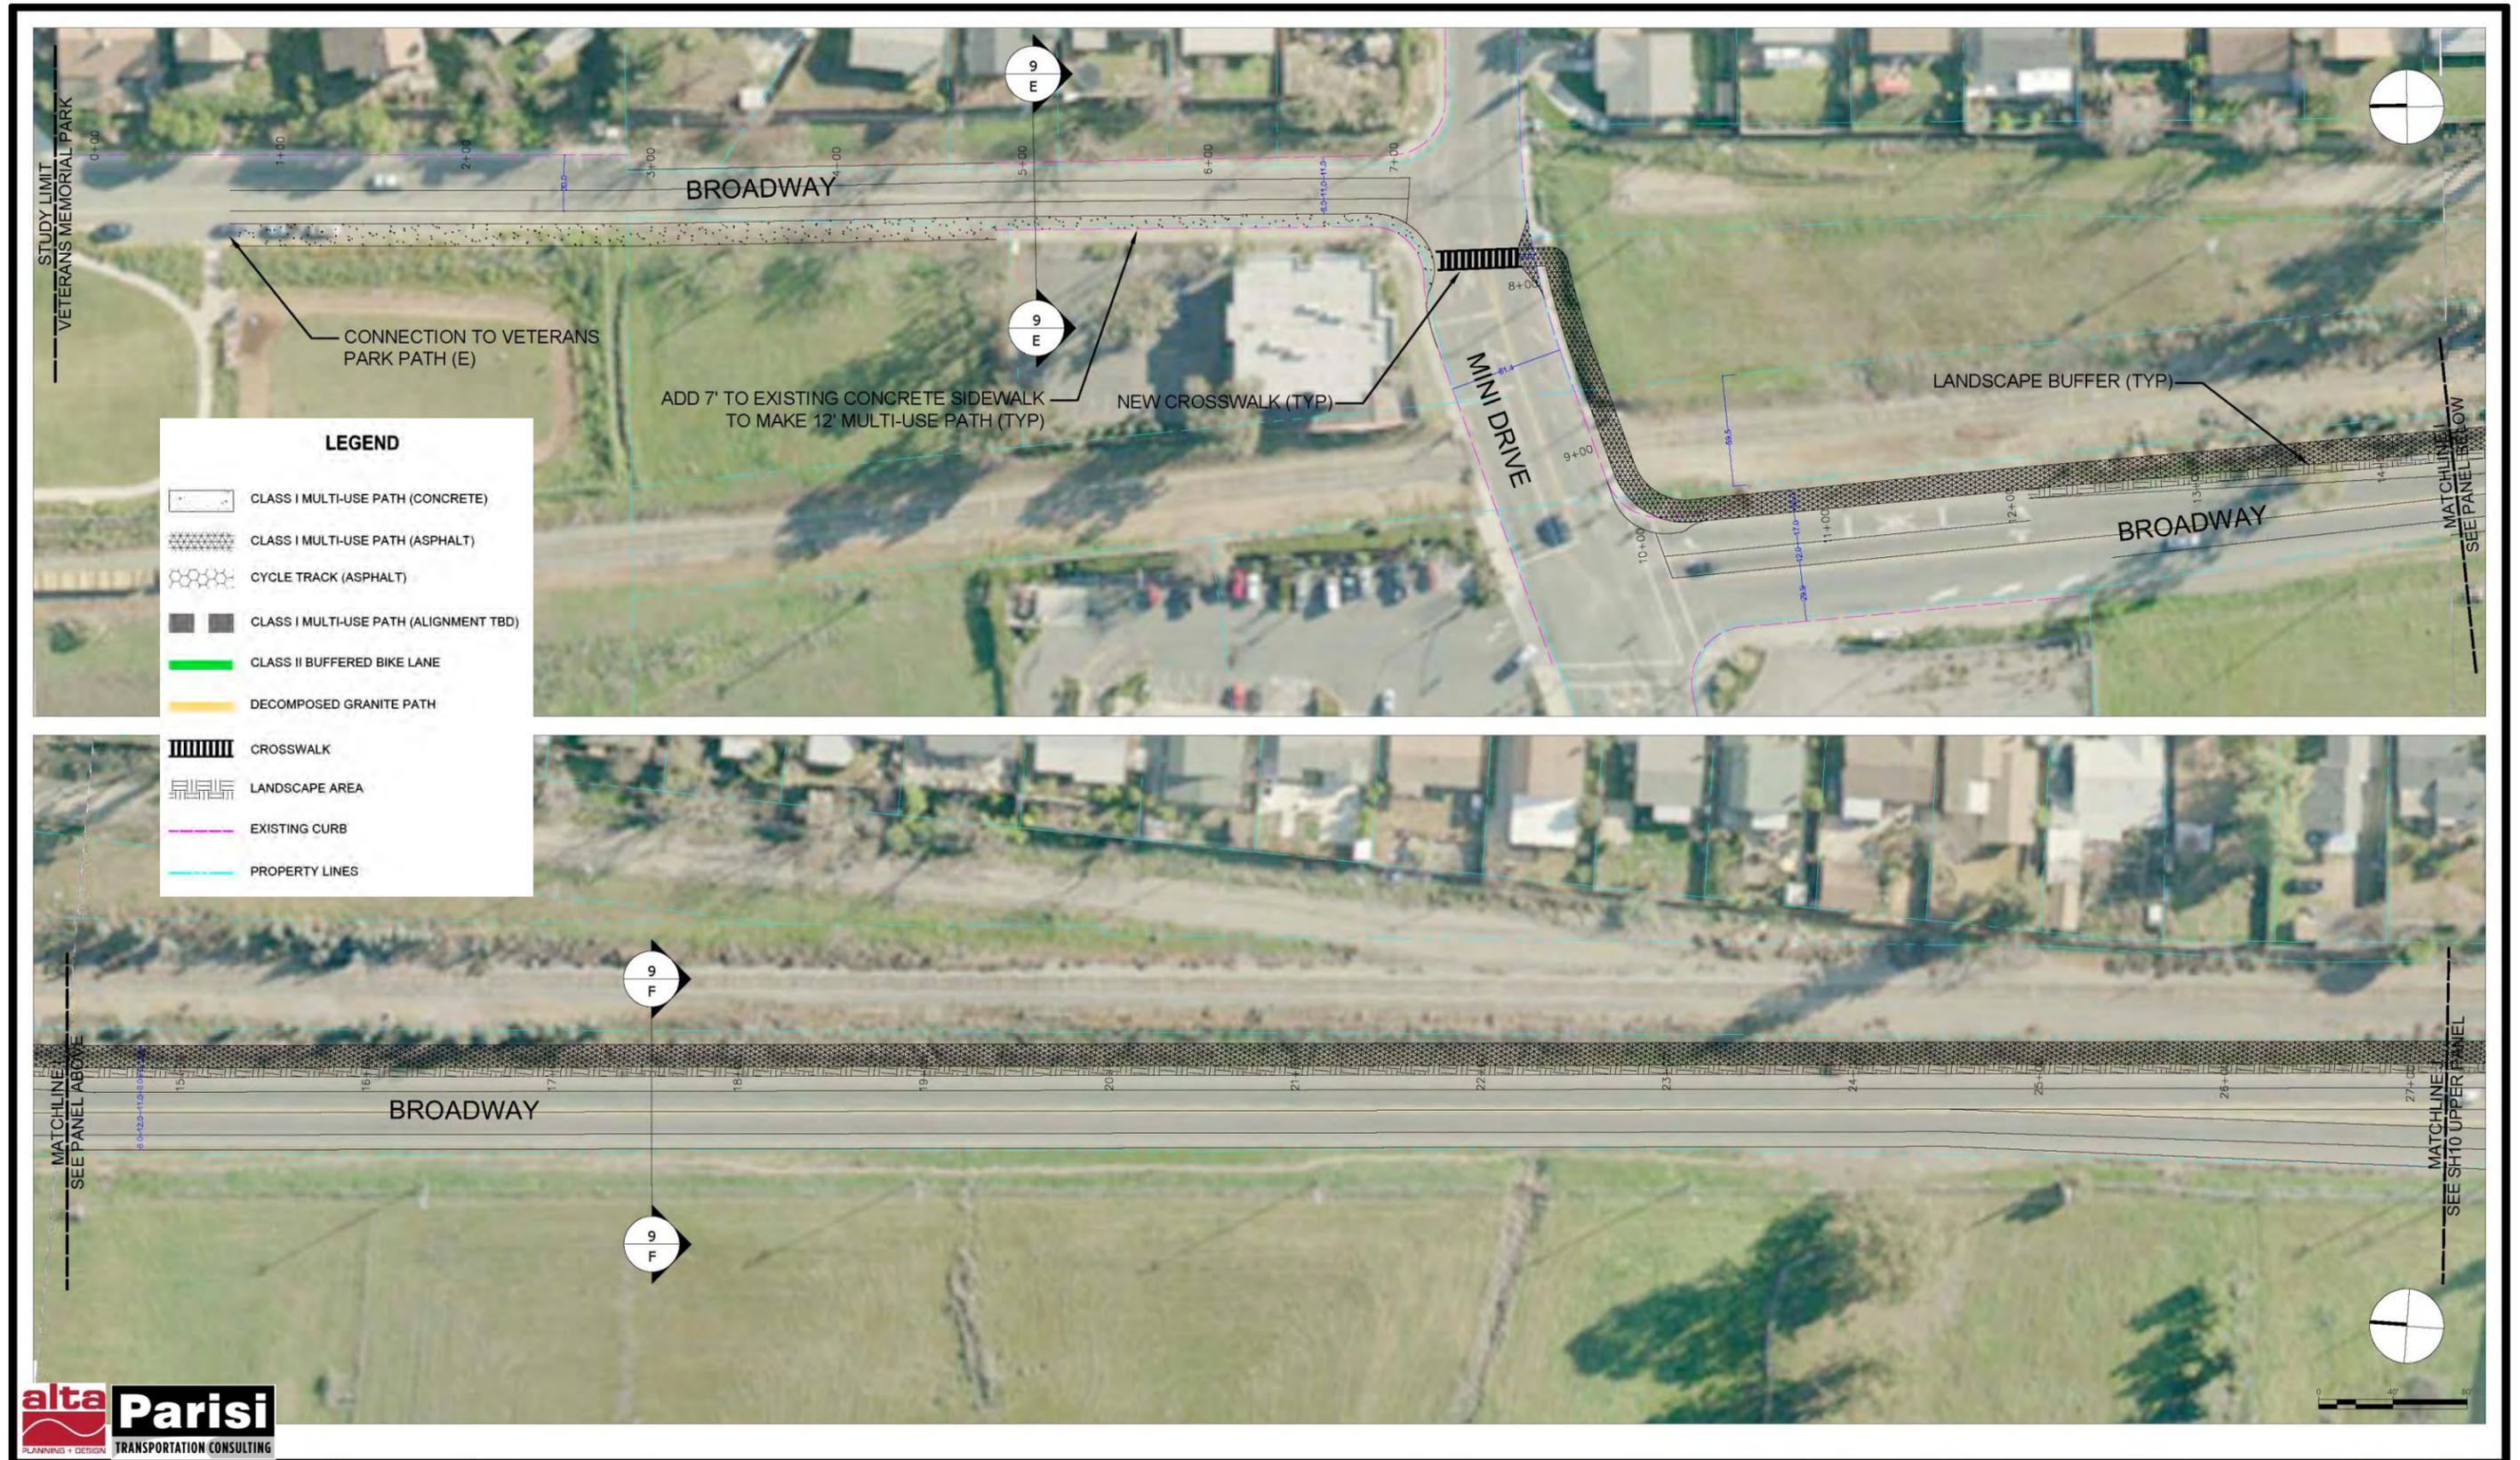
Segment 3 Detail Map A (plan set sheet 9 of 13)
